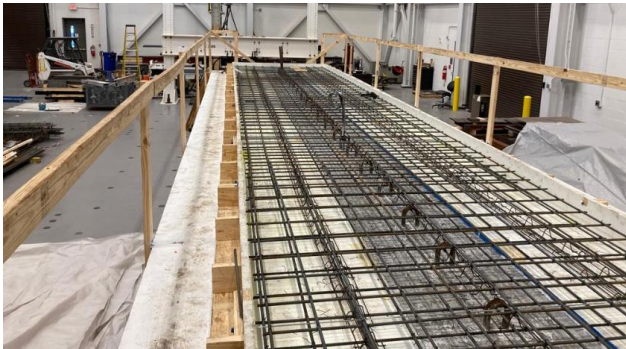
CC CIP Deck Slab with UHPC Girders.
